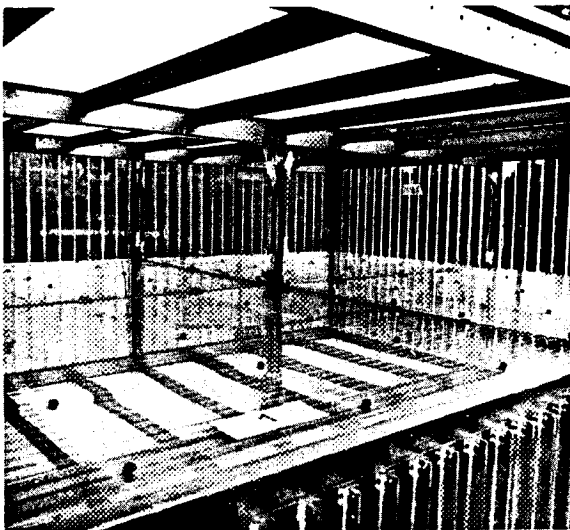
Model Building Wall and Floor Installation Details
